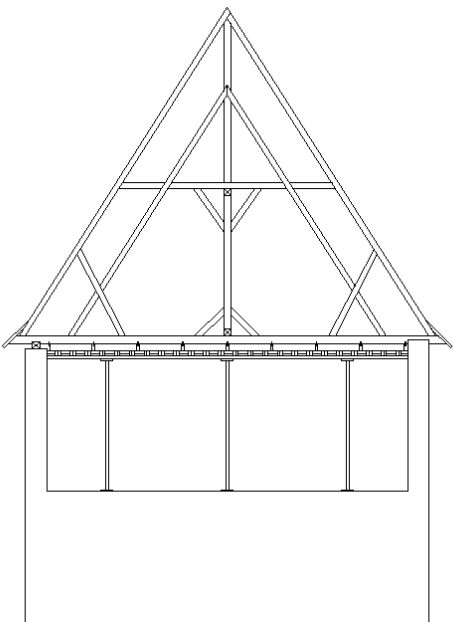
Setting of new connecting screws/nails between Tie-beam and the ceiling.
